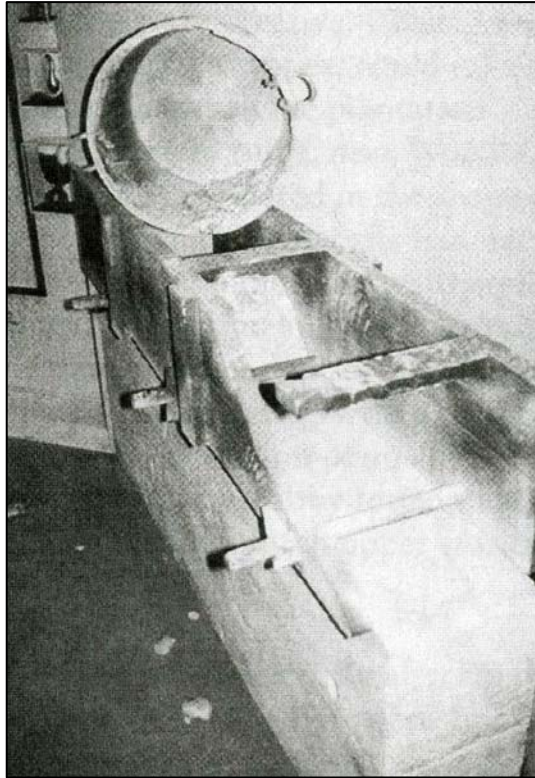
A cradle used to create tabby walls. (Photo: Lauren B. Sickels – Taves)
